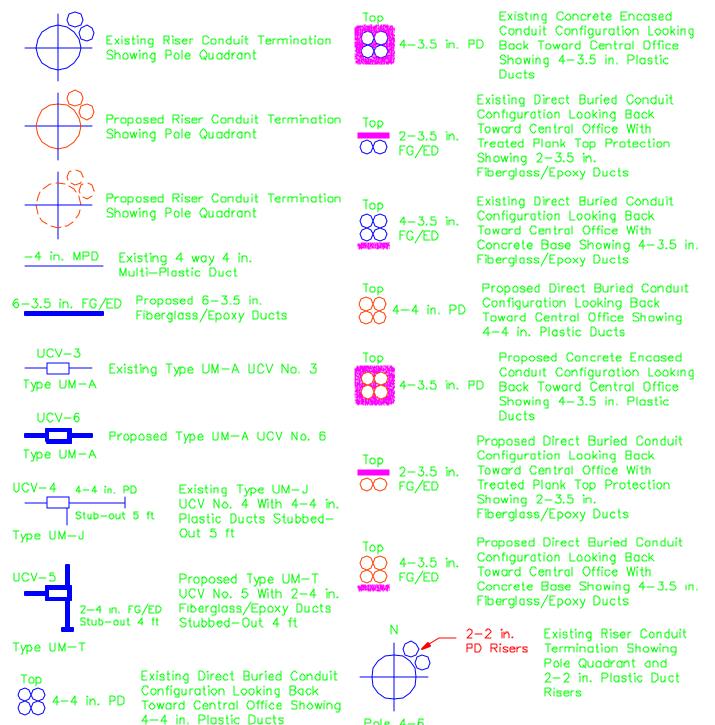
UNDERGROUND PLANT CONSTRUCTION ABBREVIATIONS AND SYMBOLS
